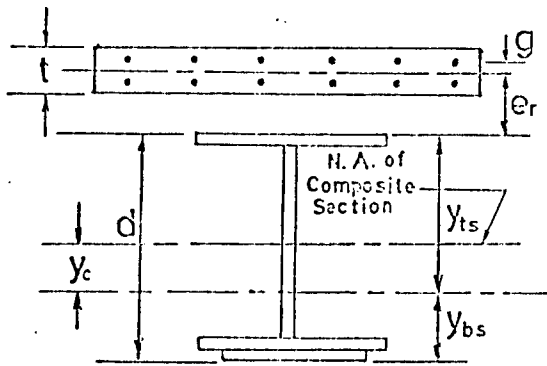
COMPOSITE BEAM SECTION, SLAB IN TENSION WITH REINFORCEMENT
